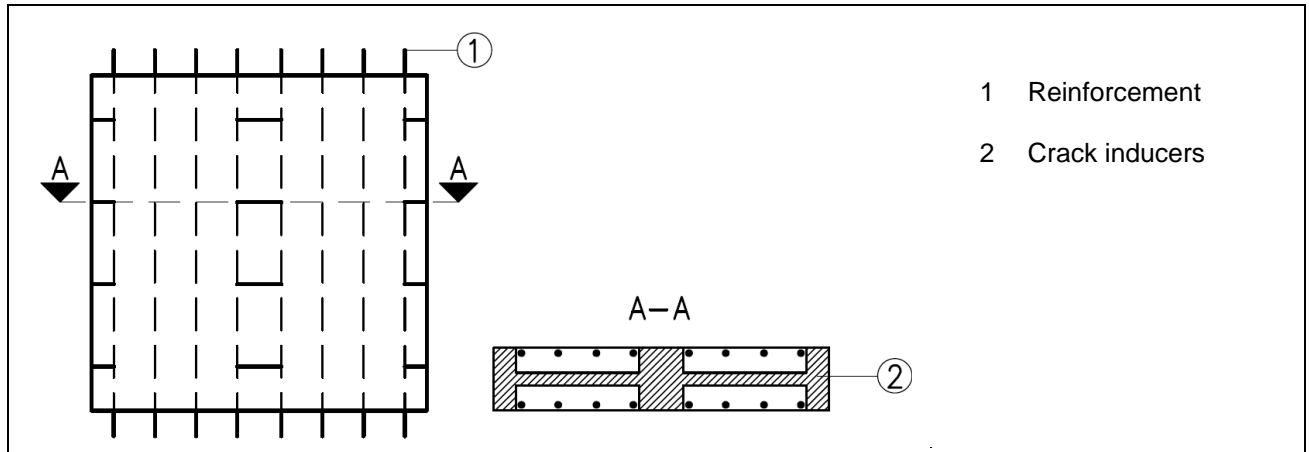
Example of a test member for anchors tested in cracked concrete
